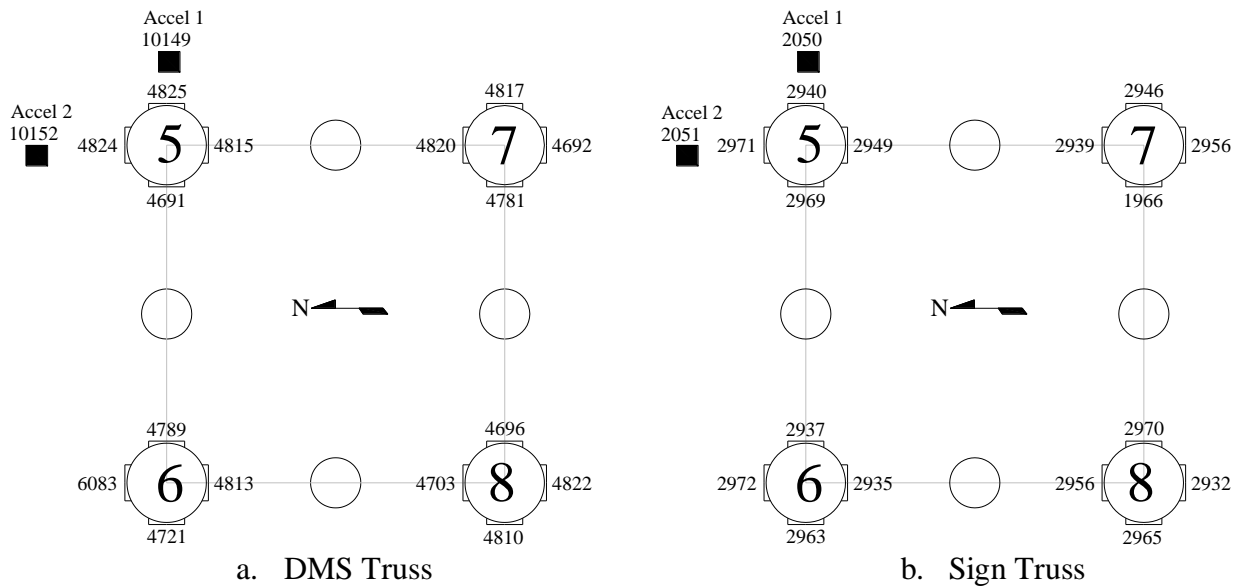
Ankeny DMS/Sign Truss instrumentation configuration at Cross Section A.
